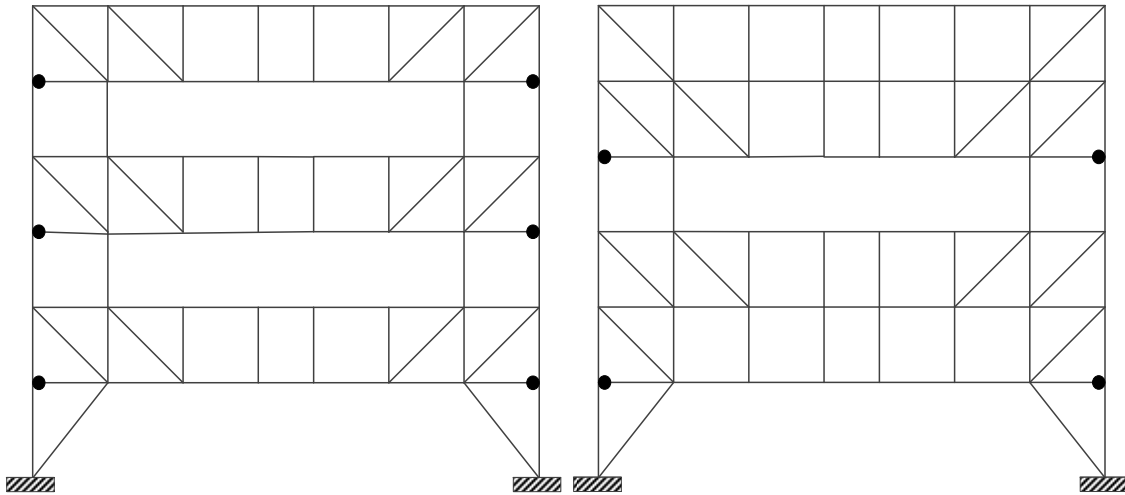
Locations of pin connections between chord members and columns in the six-story STF building: (a) odd bay; (b) even bay
